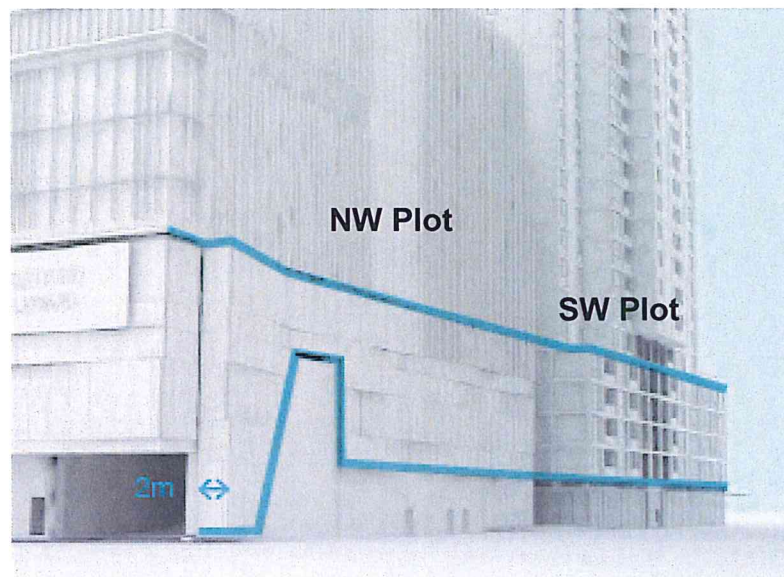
Two metre encroachment on western façade aligning with the South West Plot (Source: Applicant's modification request documents)
